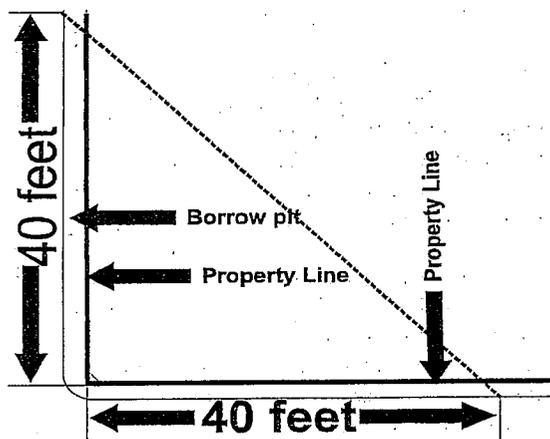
Clearview of intersecting roads, 40 foot clearview zone without sidewalk, curb and gutter.
